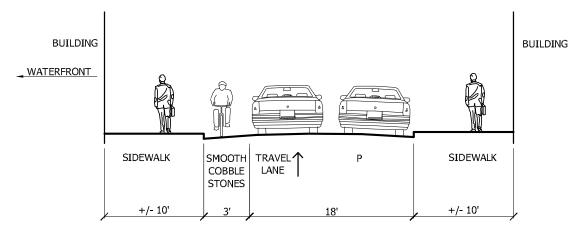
Possible Configuration for Plymouth Street looking west from Jay Street
